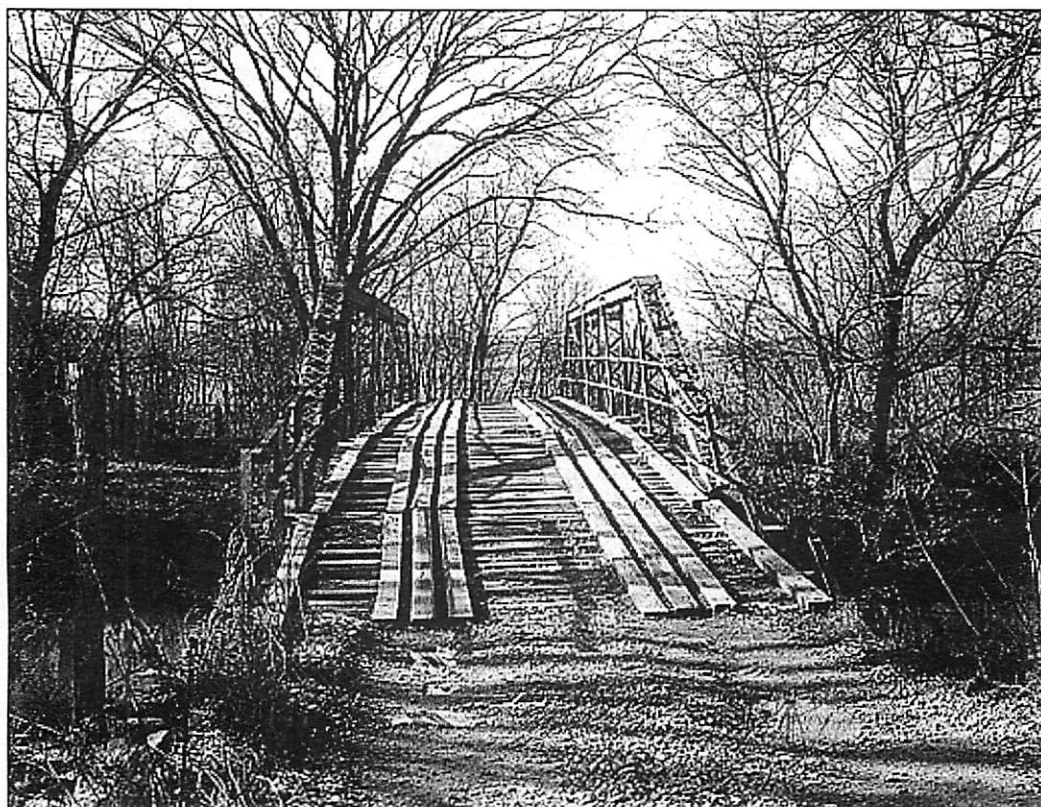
Through view of bridge, looking west (1985 HAER photo).
